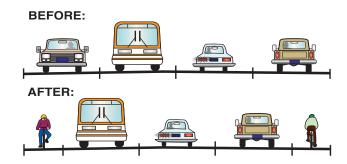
4-lane, two way street restriped with 2 lanes in one direction, 1 in the other and bike lanes
